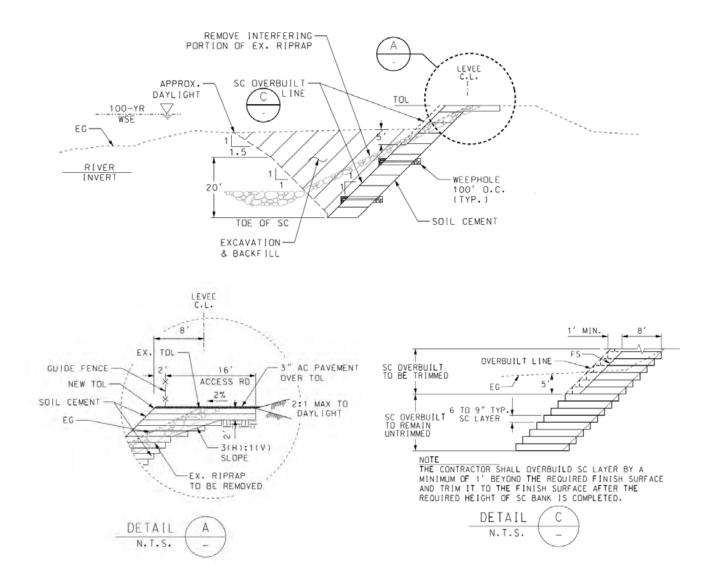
Typical Soil Cement Bank Protection along Existing Levee Alignment
